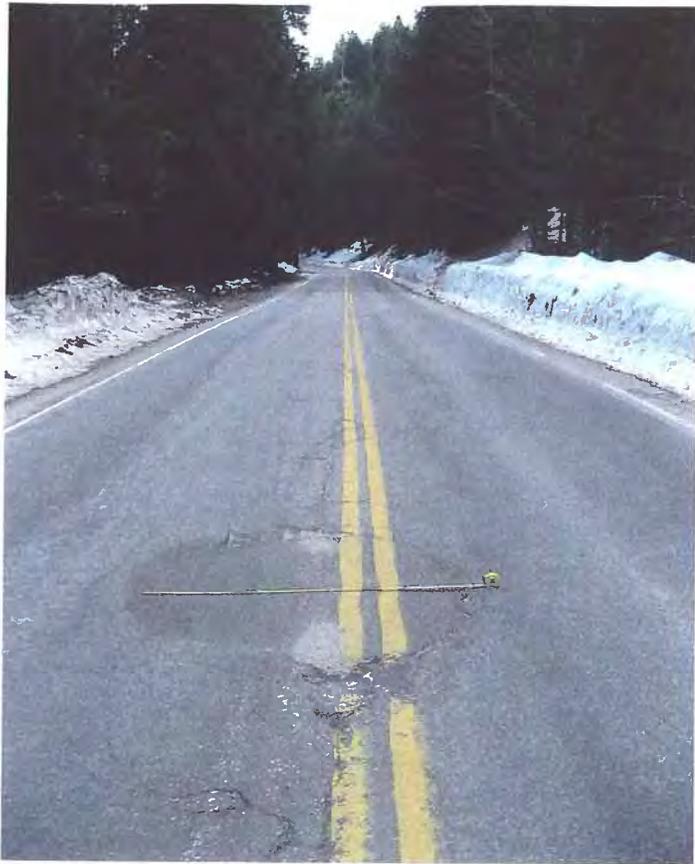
MP 0.20-0.26 - Typical moderate to high severity transverse cracking.
